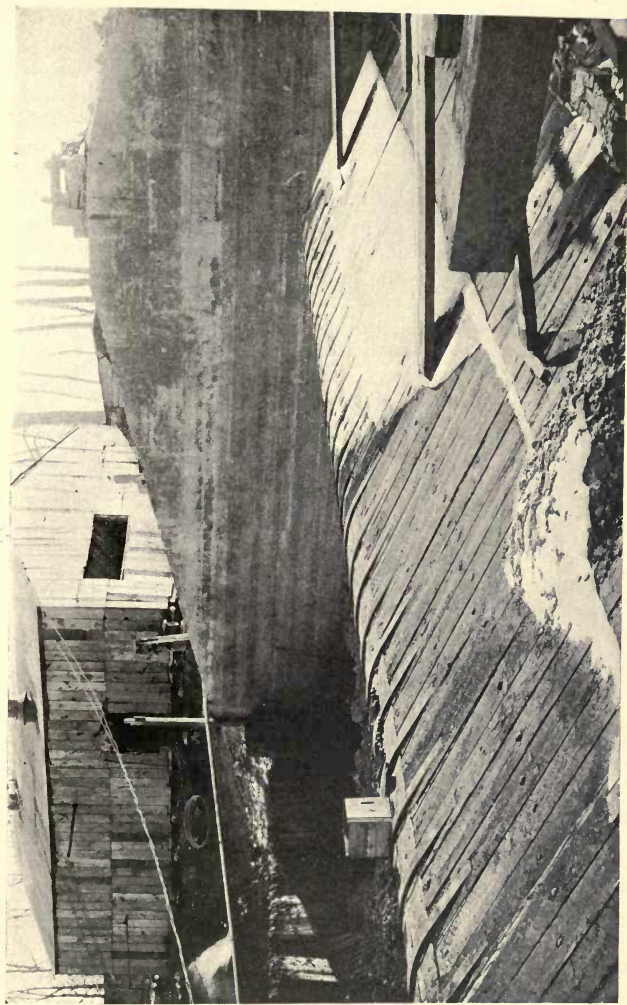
Southside Abutment, Lower Yellowstone Dam, with portion of Main Dam.
